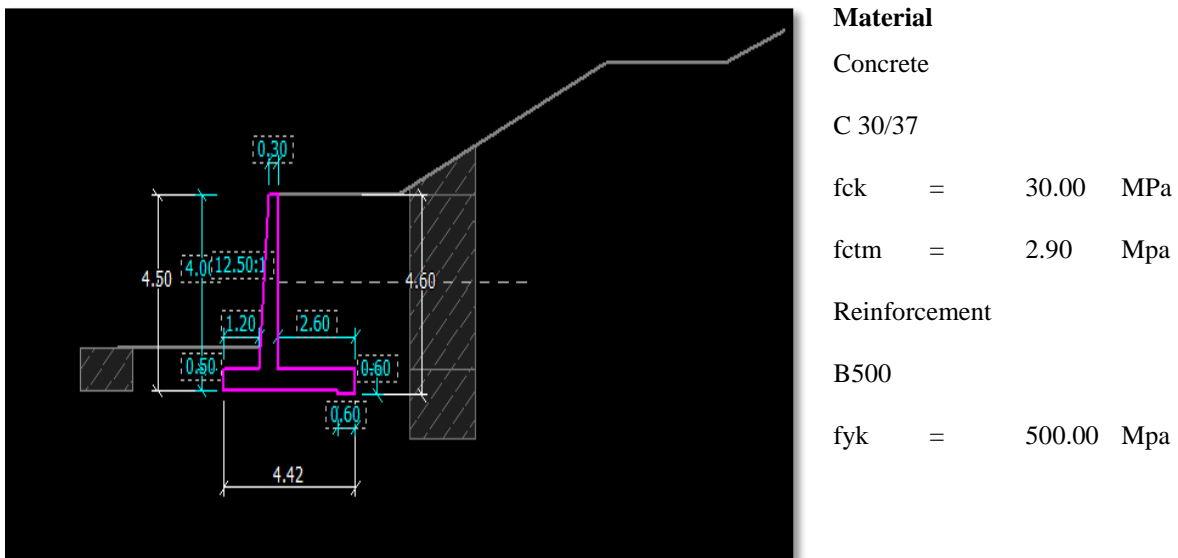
Geometry of a cantilever retaining wall design by (Geo 5)
